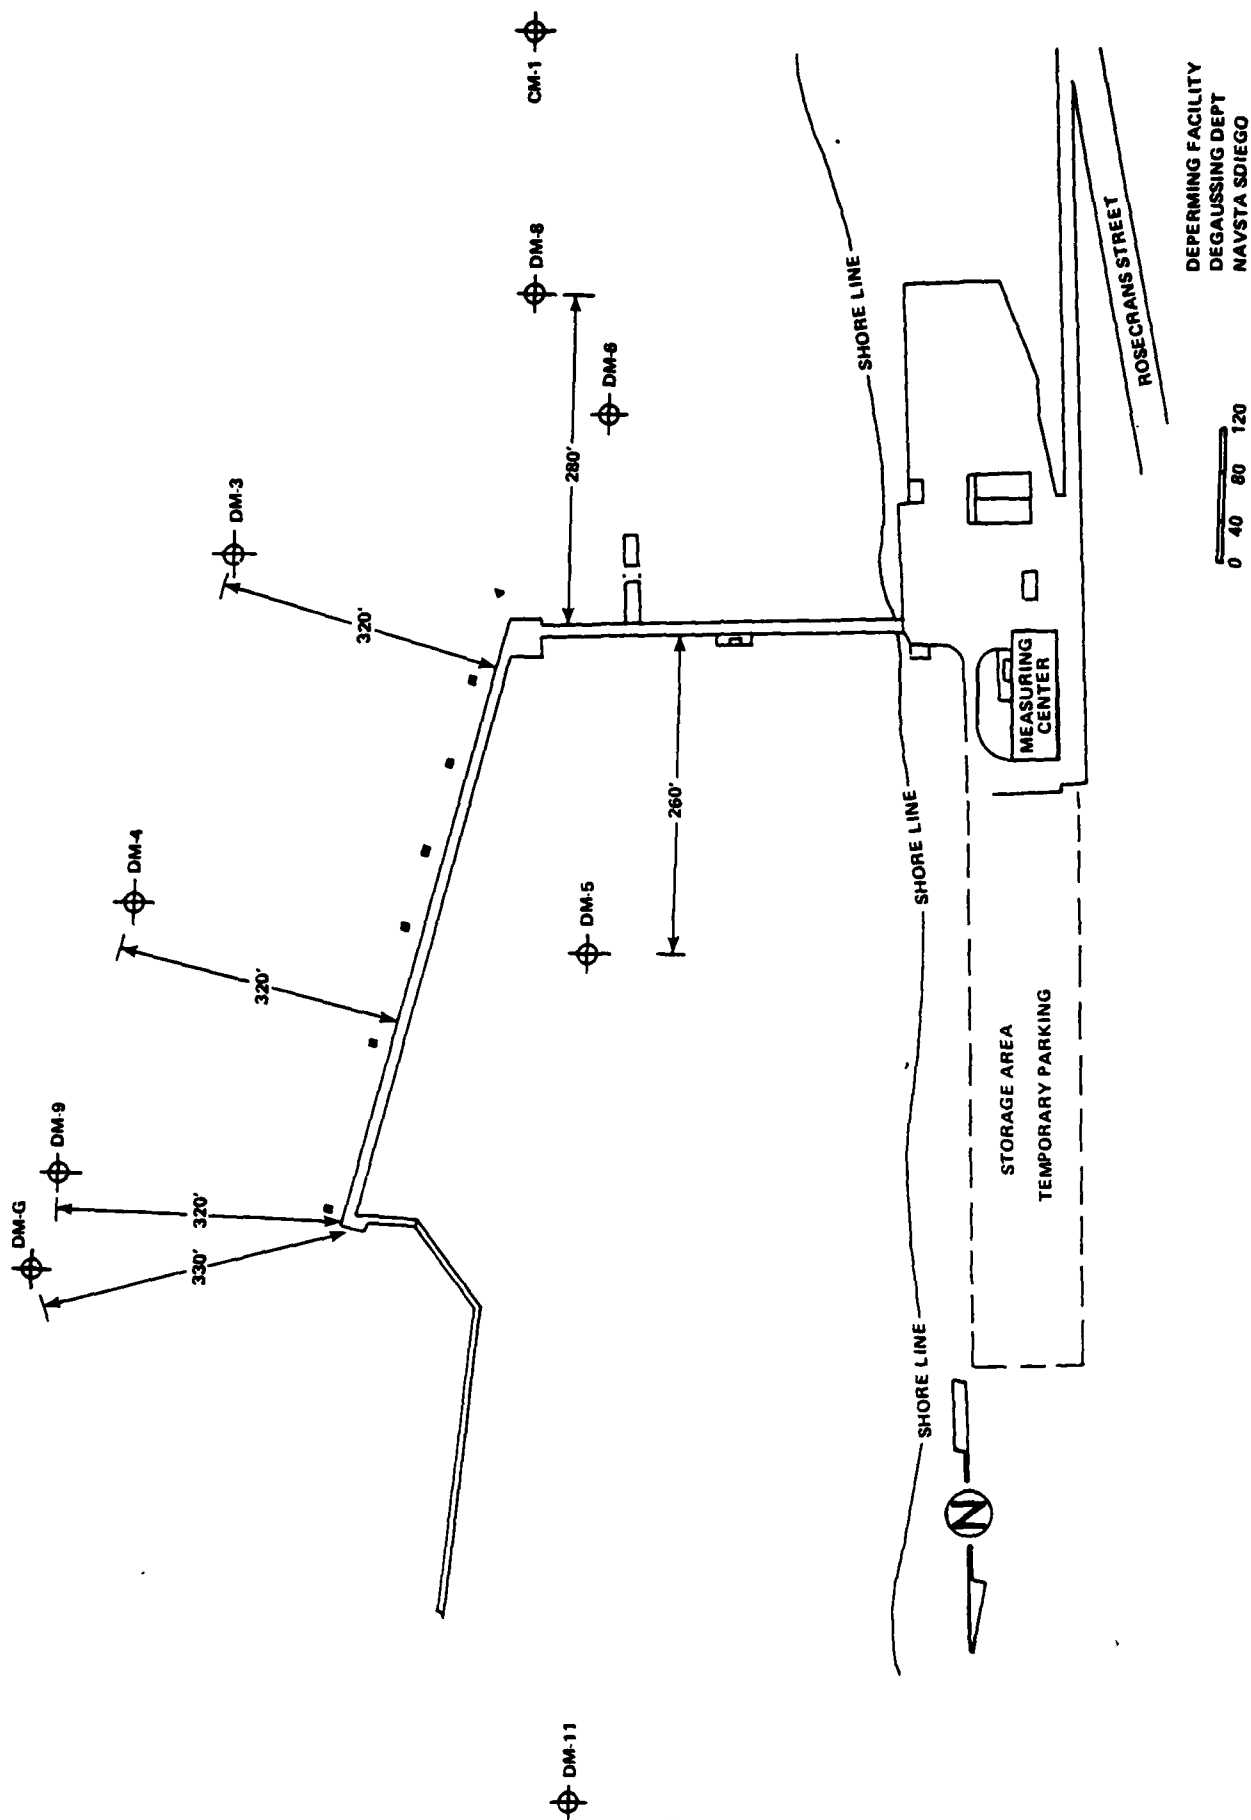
LATEST POSITION OF MOORINGS INSPECTED NEAR DEPERMING PIER
